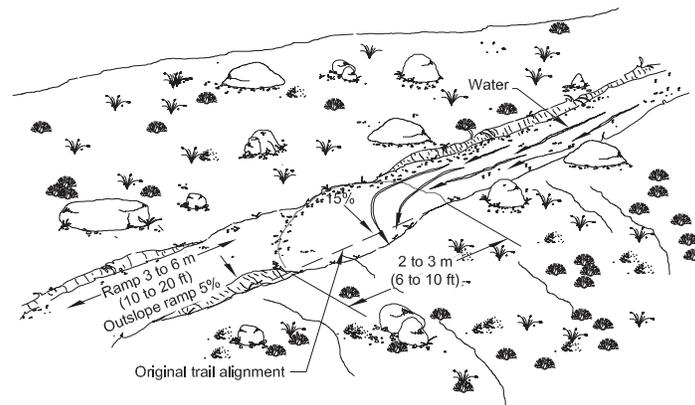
A rolling grade dip builds on the knick design. It helps direct water off steeper sections of existing trail.
